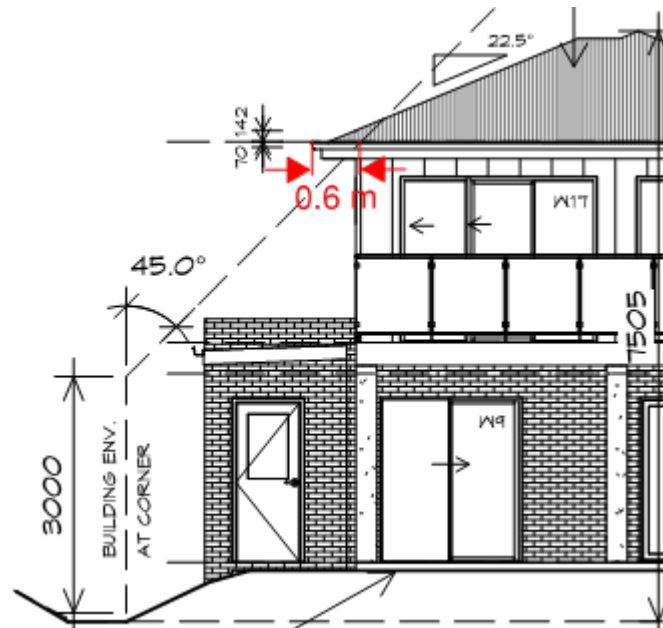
Rear elevation showing the proposed dwelling in relation to the building envelope adjoining 23 Eaves Ct (0.6m measurement by author)
